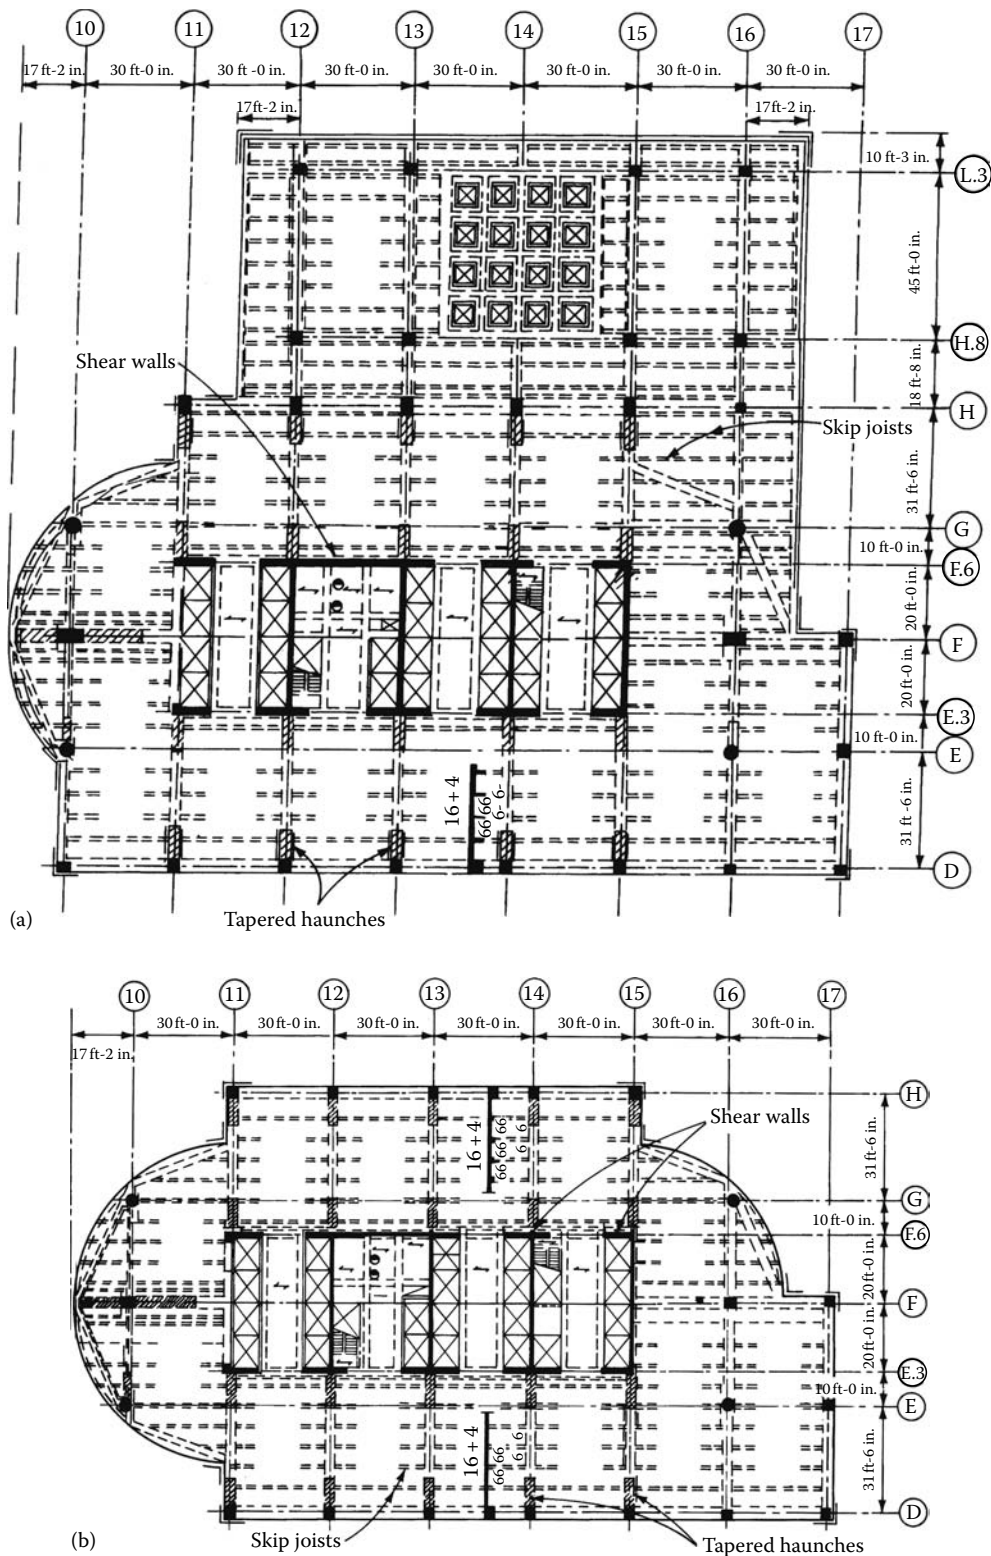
Framing plans. (a) Levels 2 through 14 floor plan, (b) levels 15 through 26 floor plan, (continued)
